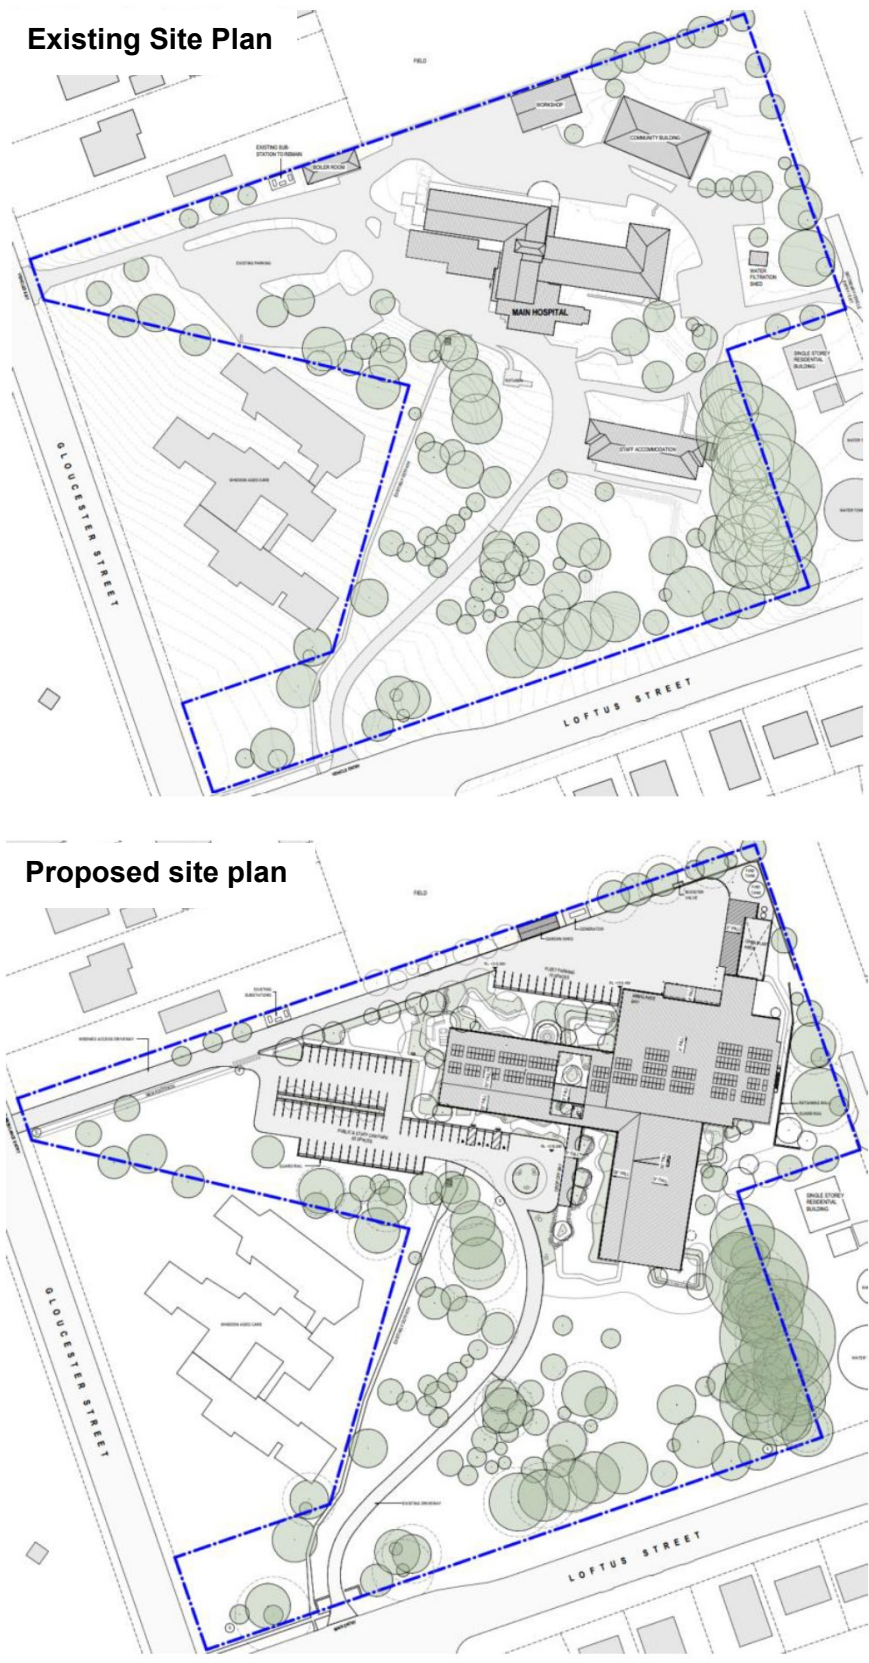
Existing site plan and proposed site plan (provided by Capital Insight)
